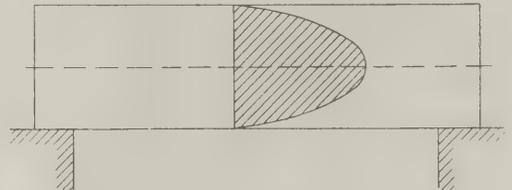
Showing Shearing Force in Wood or Steel Beam
